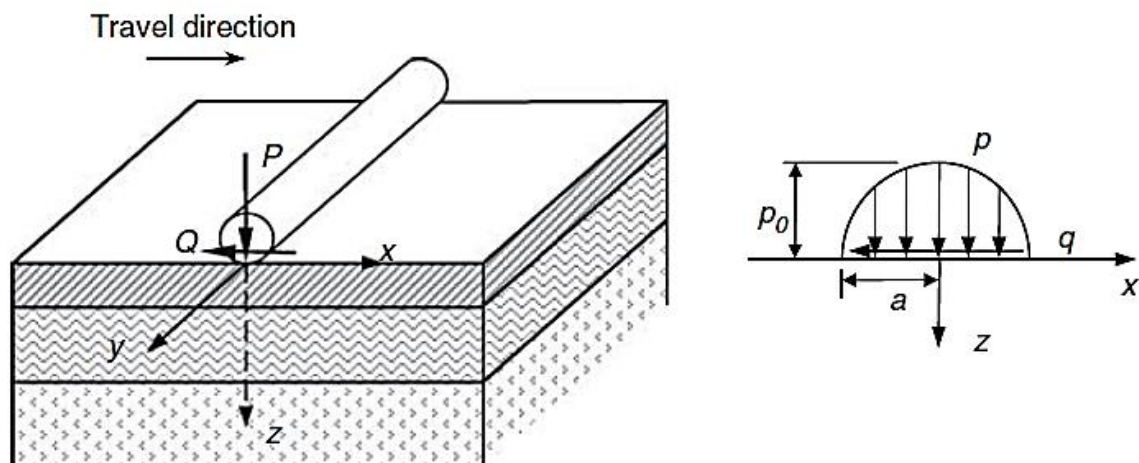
Pavement under a 2D moving load (Wang and Yu, 2013).
